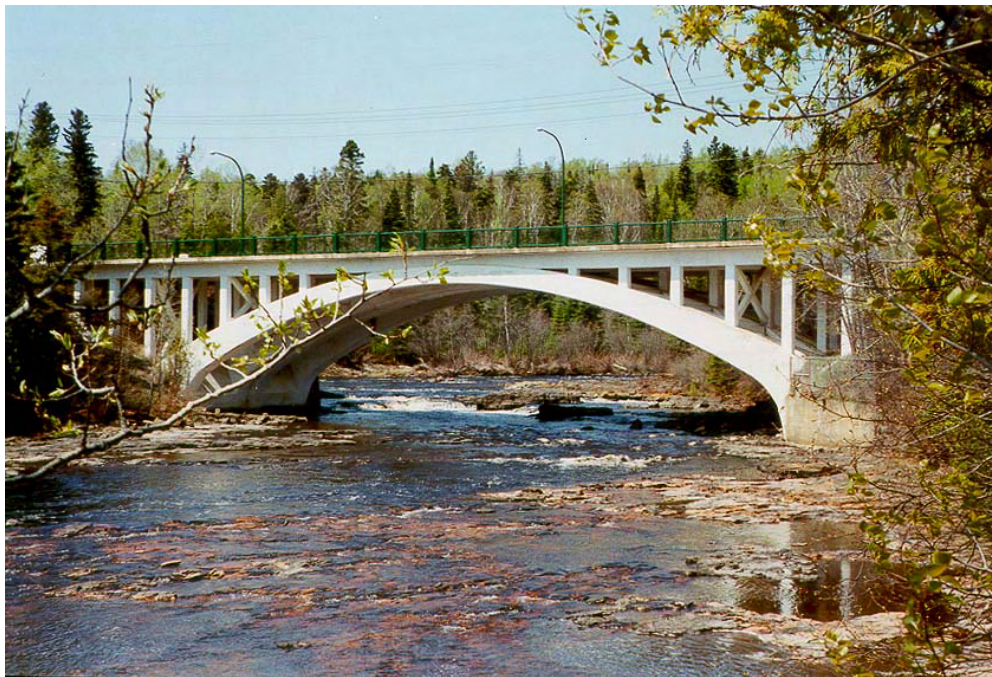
The Black Bay bridge in the city of Thunder Bay was one of the first single spandrel reinforced concrete bridges ever constructed (MHSTCI).
